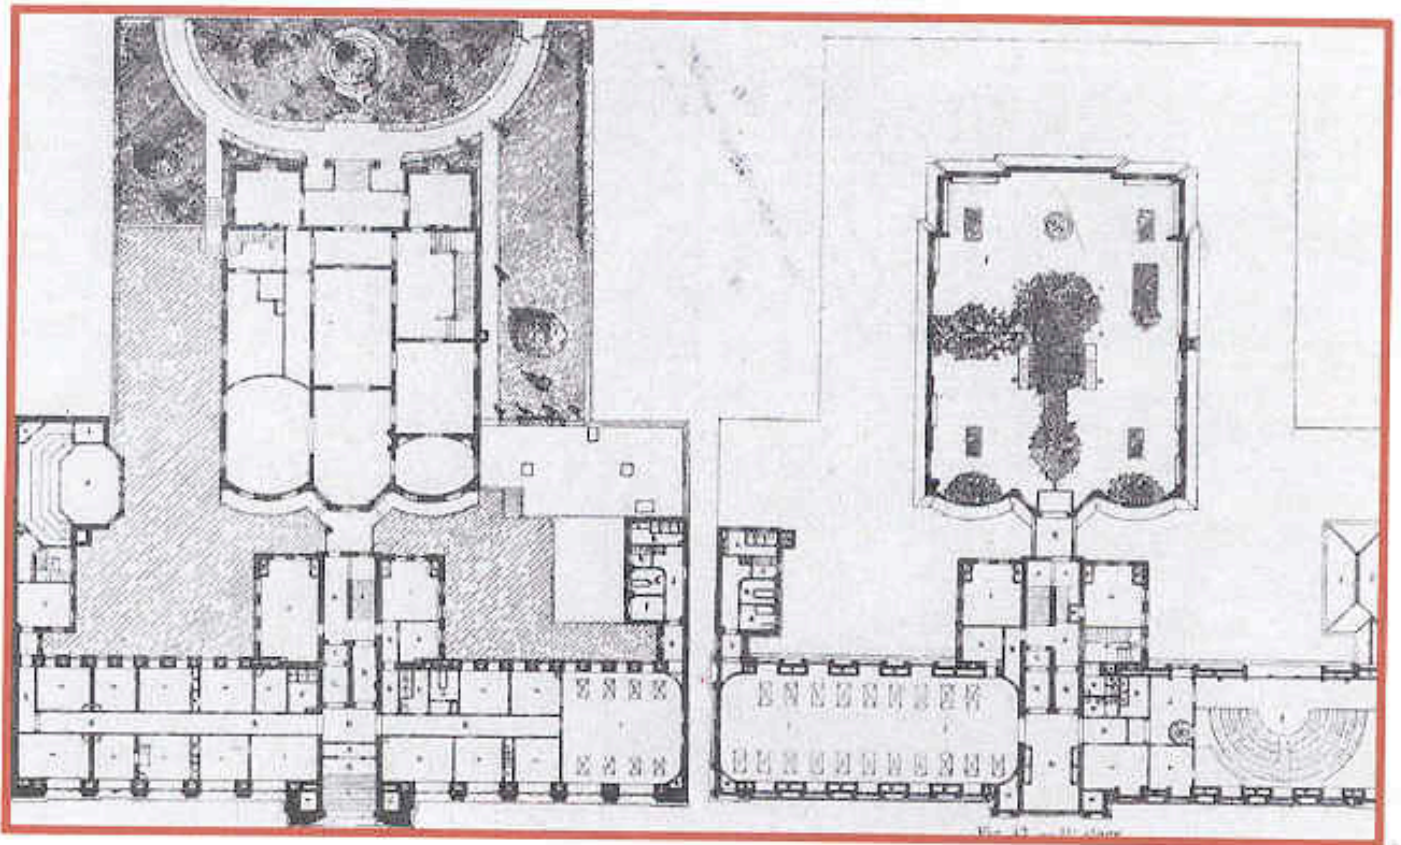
NEW YORK HOSPITAL BUILDINGS.—PLAN OF SECOND, THIRD AND FOURTH STORIES.
